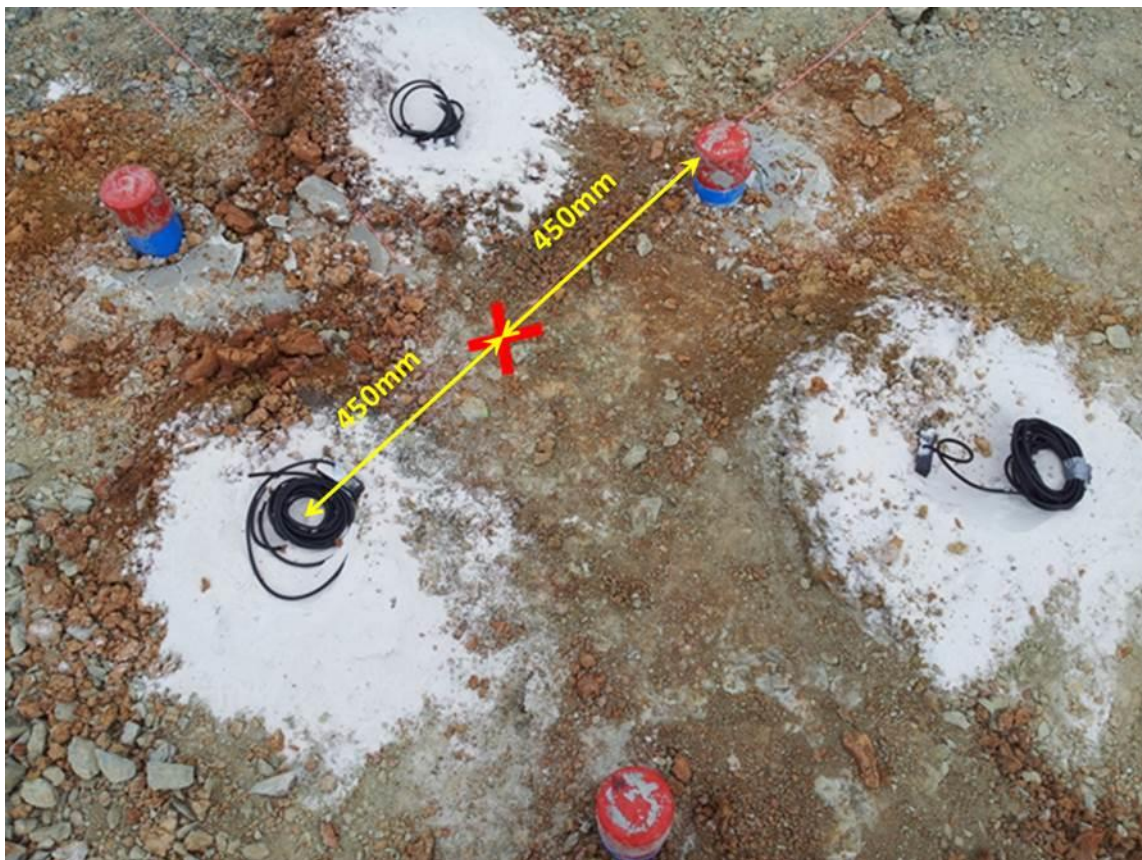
Typical pile layout on site (Pile B) with inclinometer tubes and TDR
